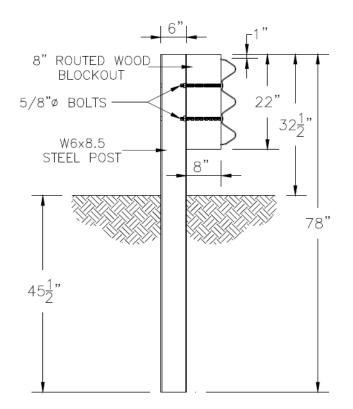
Cross-section of the G9 thrie beam guardrail.
